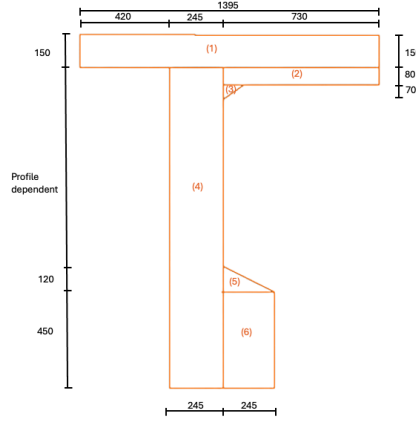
Boundary girder ZIPXL2000 divided into 6 shapes
